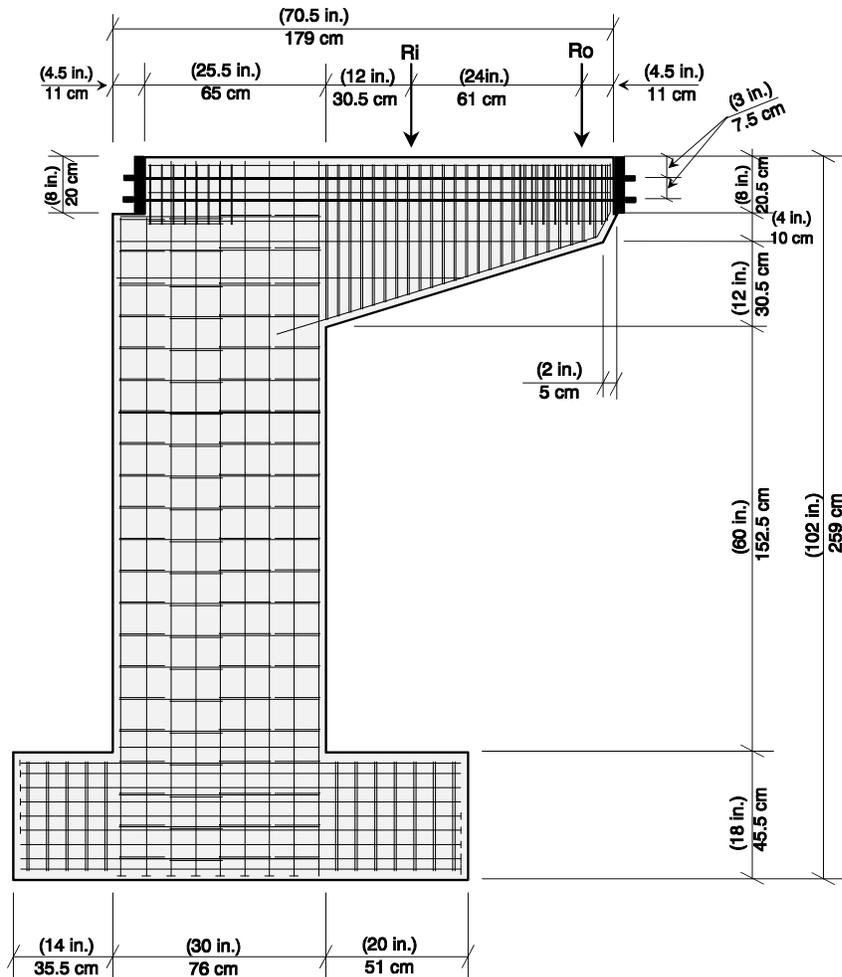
Elevation of reinforcement for POJ-PS-100
